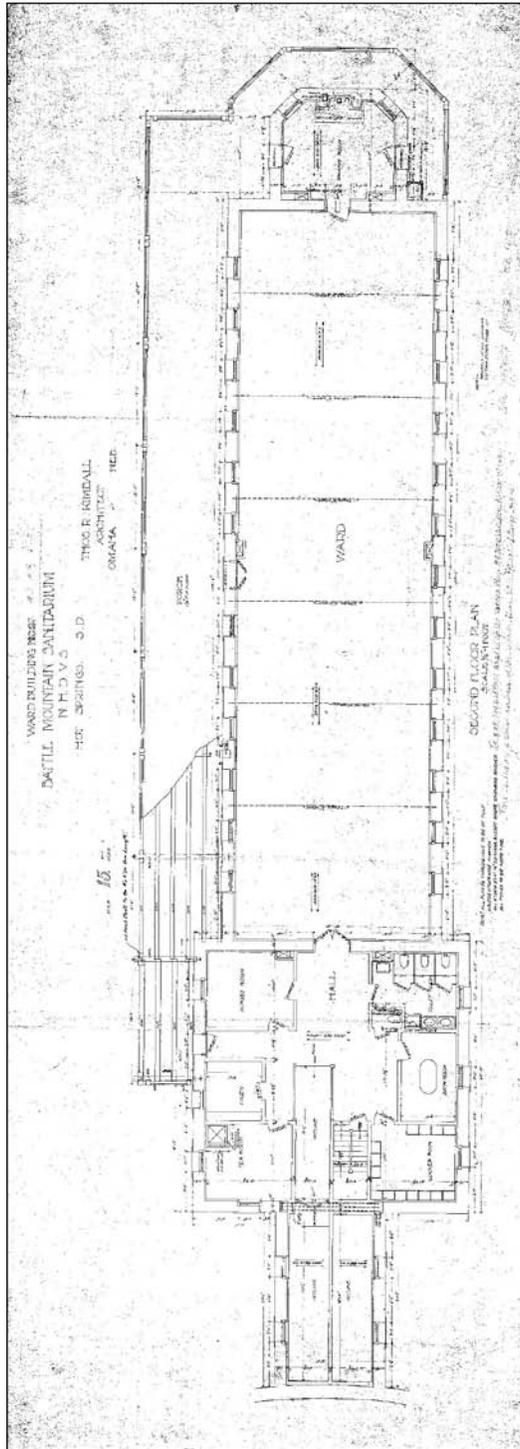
Thomas Rogers Kimball, Ward 2 (4), Second Floor Plan (Typical), (11 June 1903)
